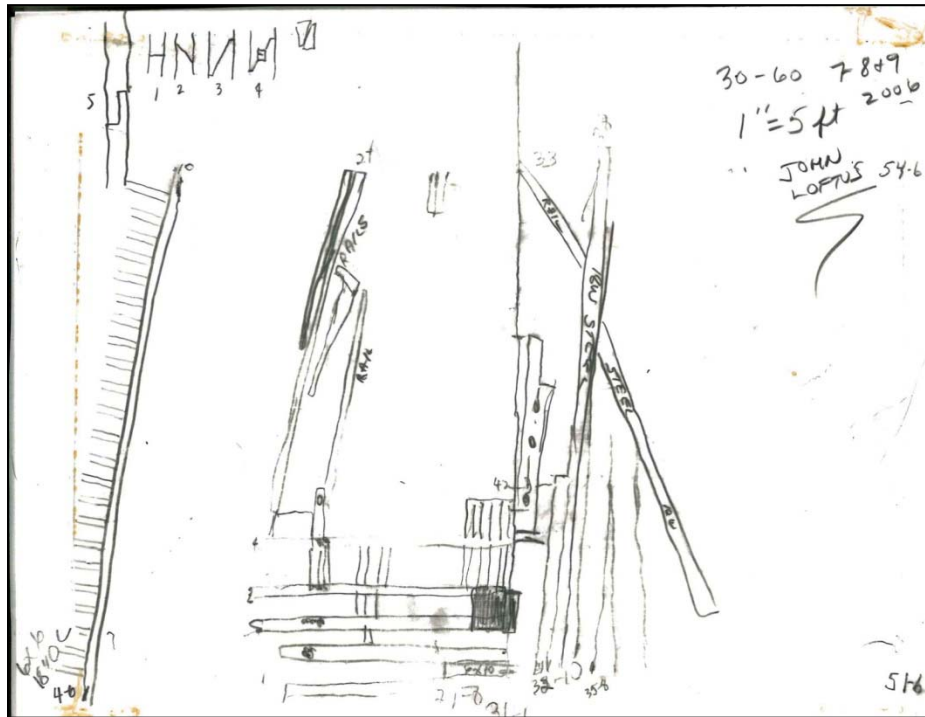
Sketch of 30 to 60' Section with Joint Details
